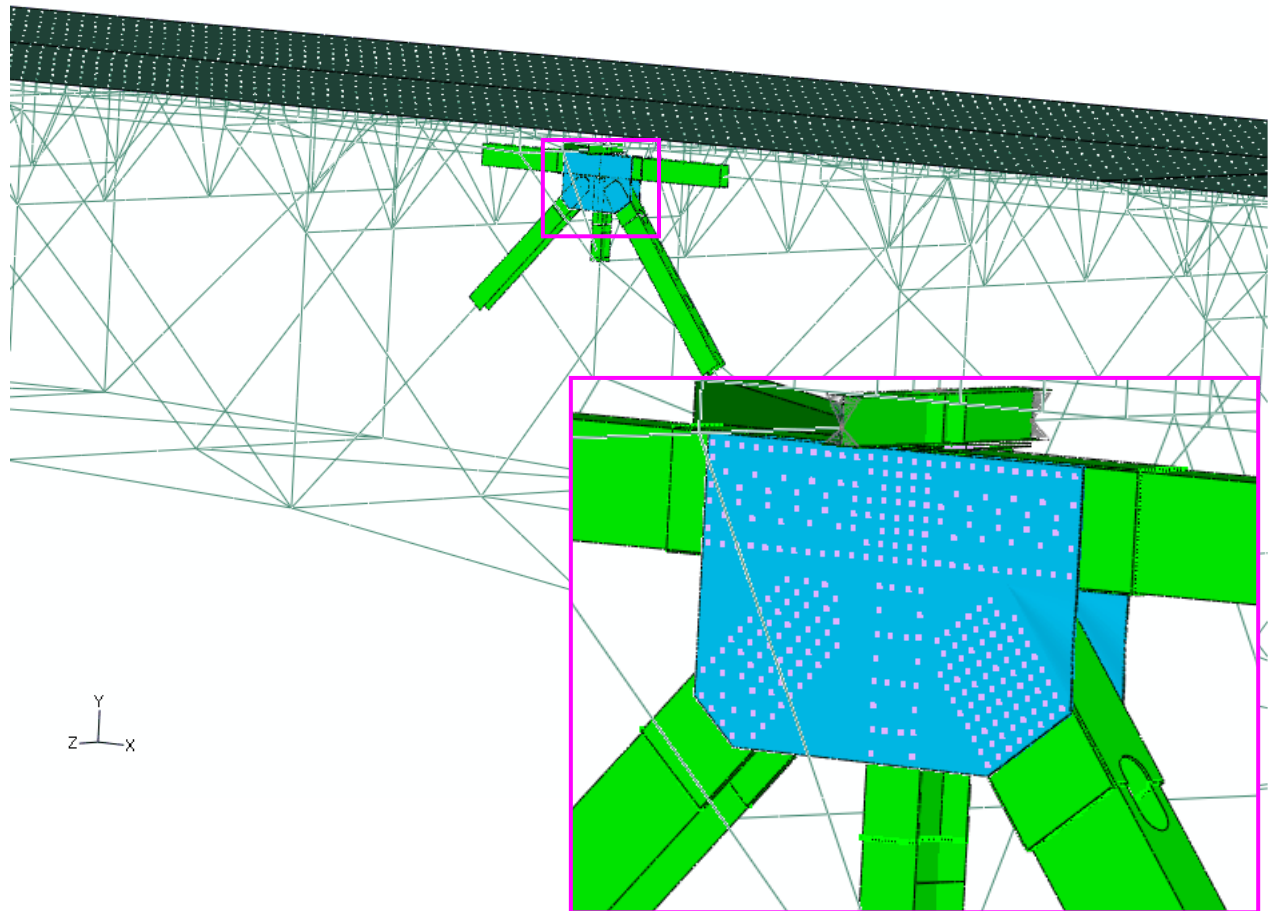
The U10W joint embedded in the FHWA structural element bridge model
